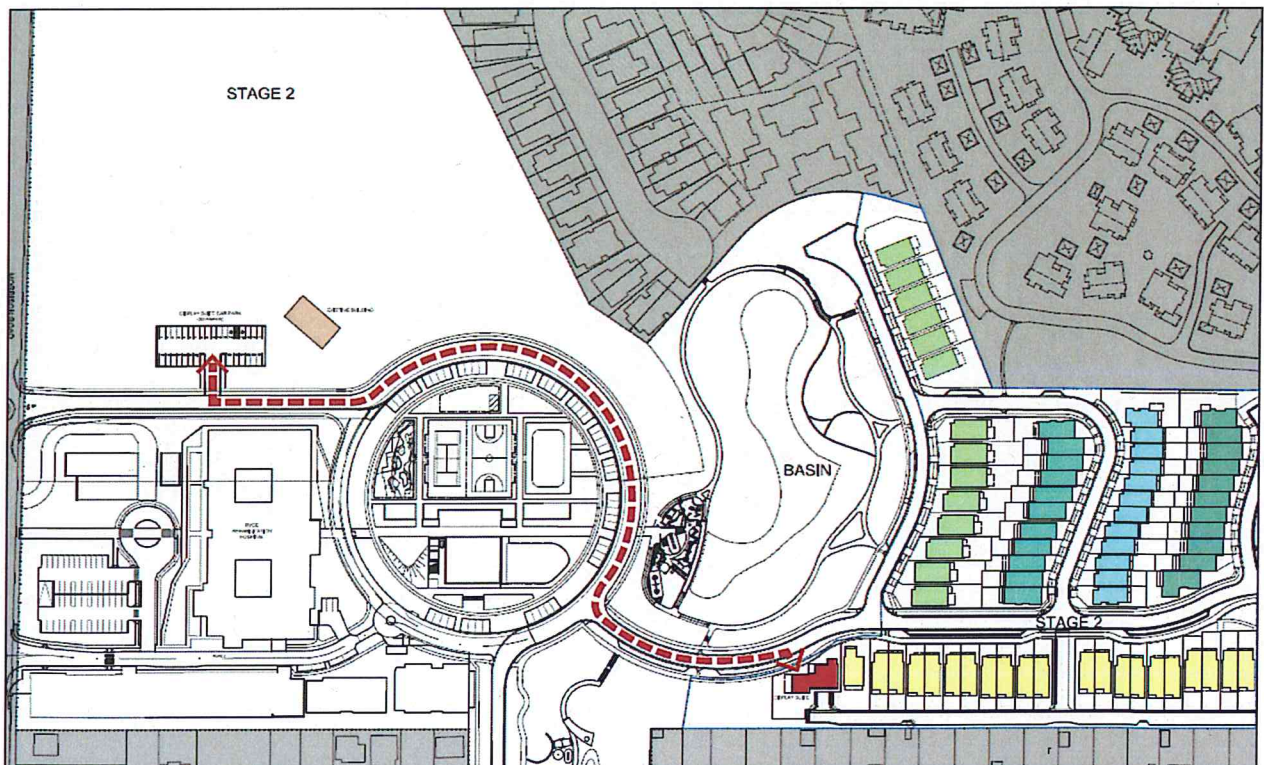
Site layout and parking associated with the sales suite (source: Proponents Application)
